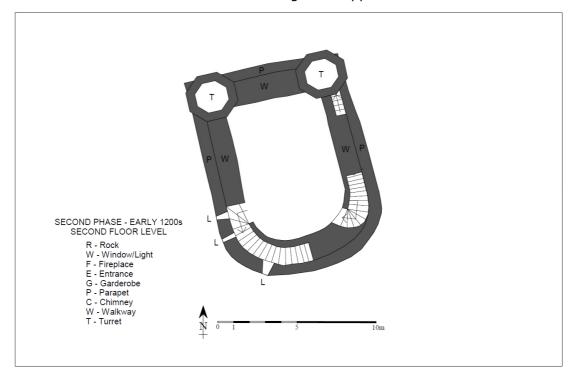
Second Floor Level of D-Shaped Tower *c*.1200
